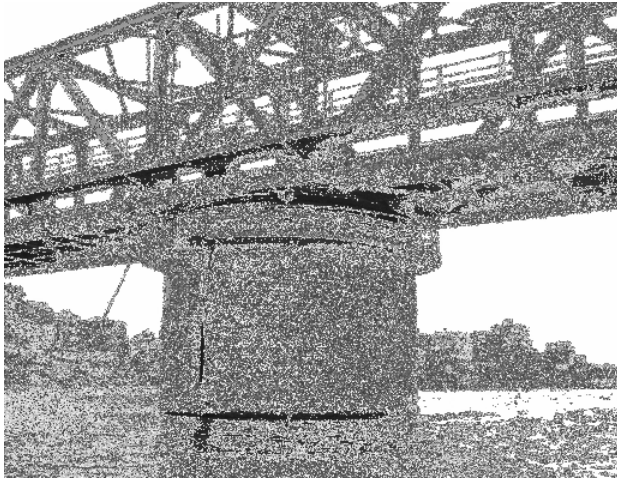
Central (largest circular) pier of Kafr el-Zayat railway bridge
